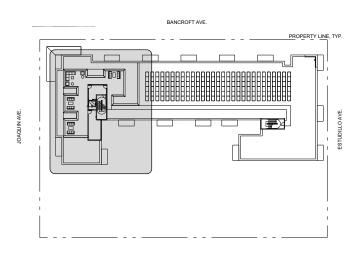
## EXHIBIT P - LANDSCAPING MATERIALS PLAN - GROUND FLOOR
